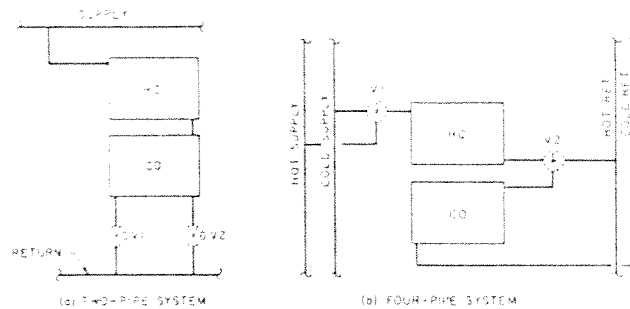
Split Panel Piping Arrangement for Two-Pipe and Four-Pipe Systems
